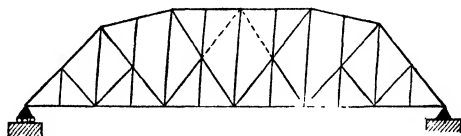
Subdivided Pratt truss with inclined top chord commonly known as the Petit truss.
